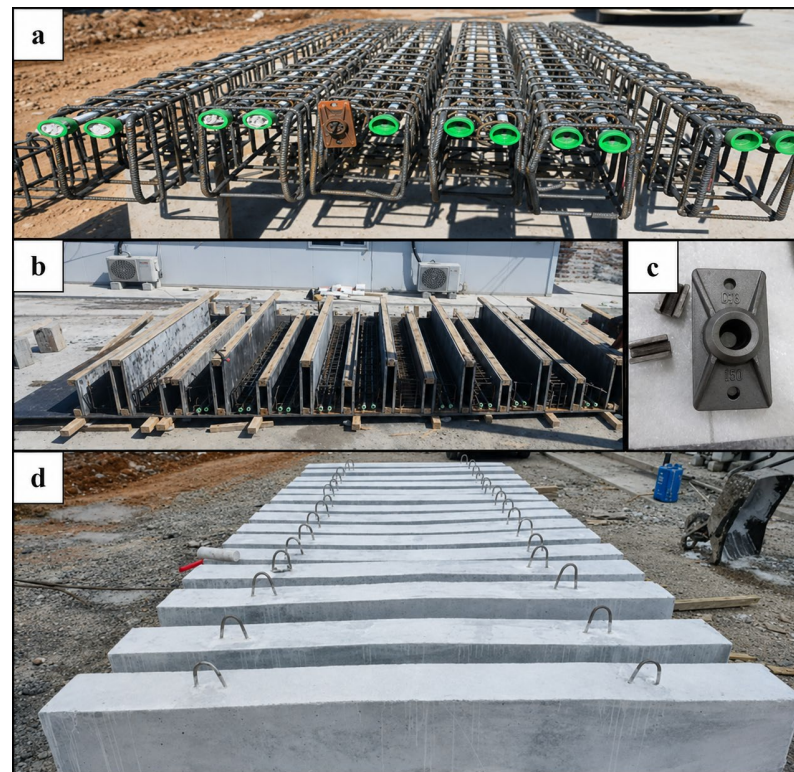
Fabrication process of test specimens: (a) reinforcement cage fabrication, (b) mold preparation and camber adjustment, (c) anchorage installation, and (d) demolded specimens.
